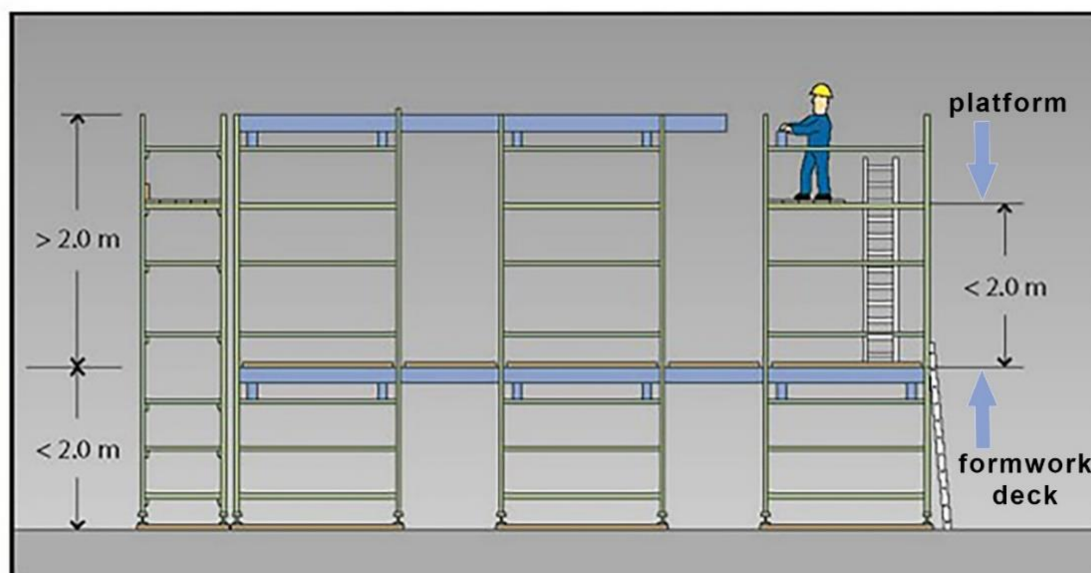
Worker erecting formwork from an intermediate work platform less than two (2) metres above a formwork deck where the deck to deck height is greater than two (2) metres.
